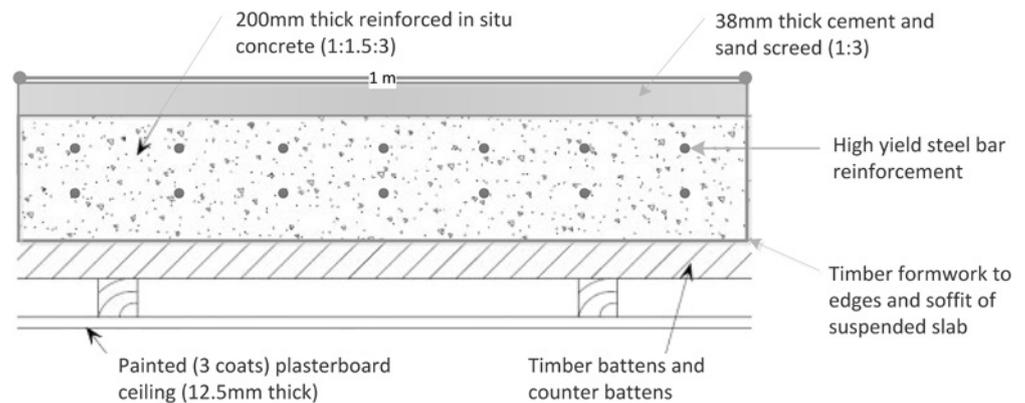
Cross section of 1m<sup>2</sup> of a typical upper floor
